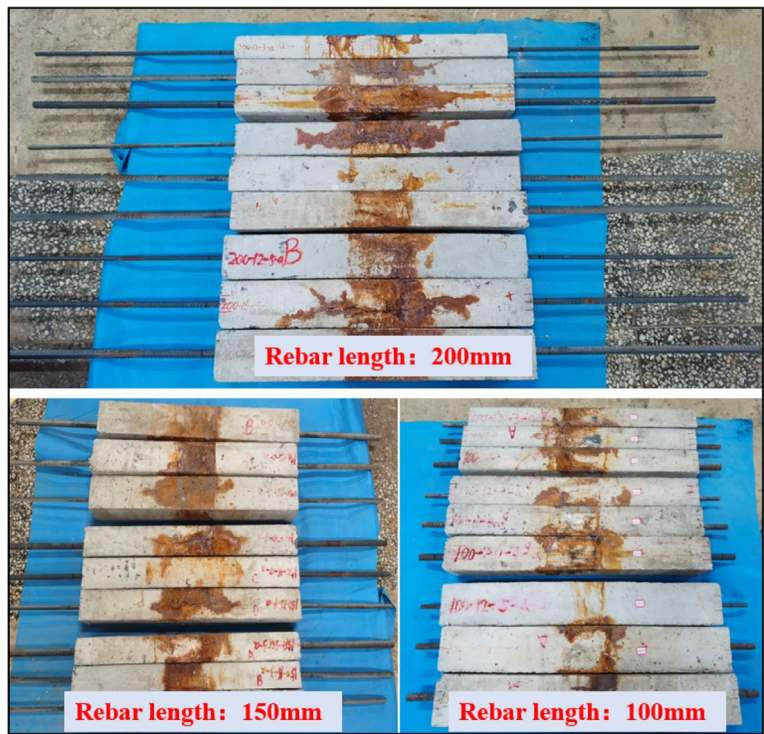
Surface condition of corroded steel bar of concrete structure specimen
